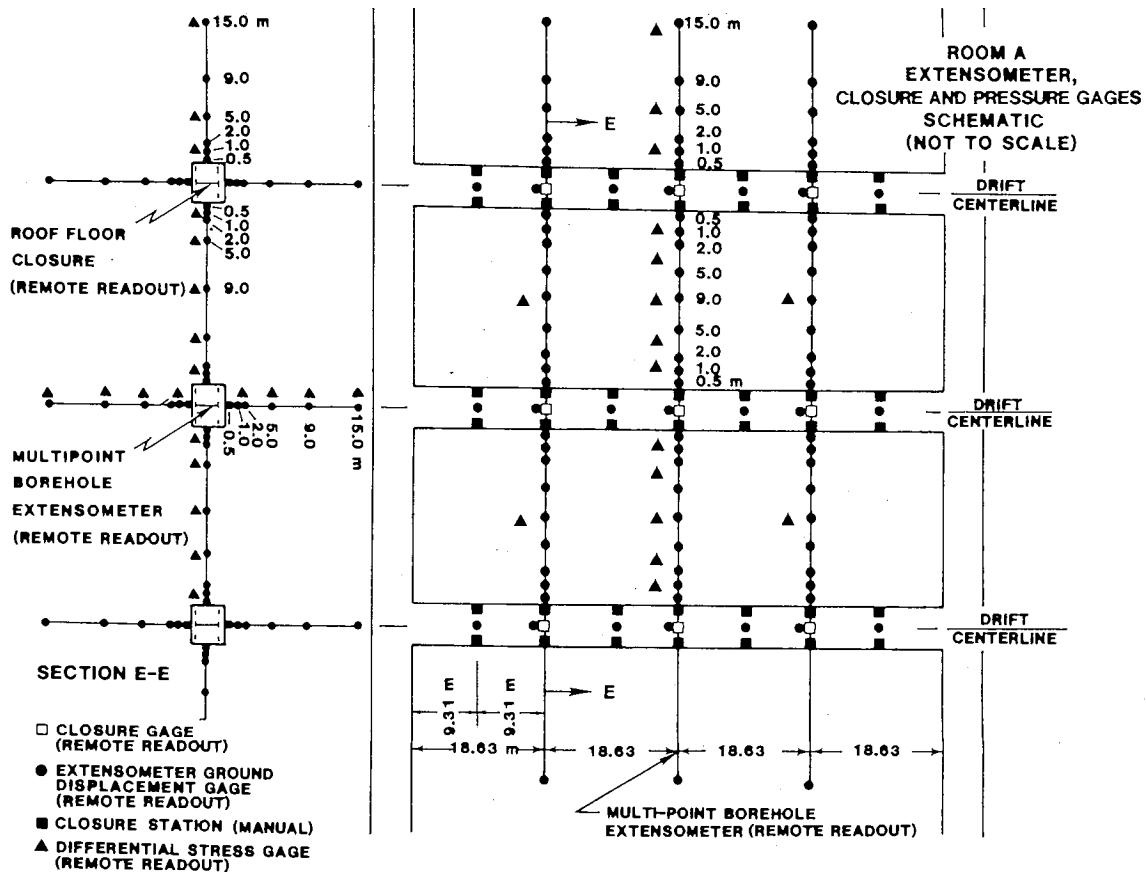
Plan and Elevation Cross-Sectional Views of Geomechanical Gage Arrays for the 18-W/m<sup>2</sup> RRC Mockup Test
